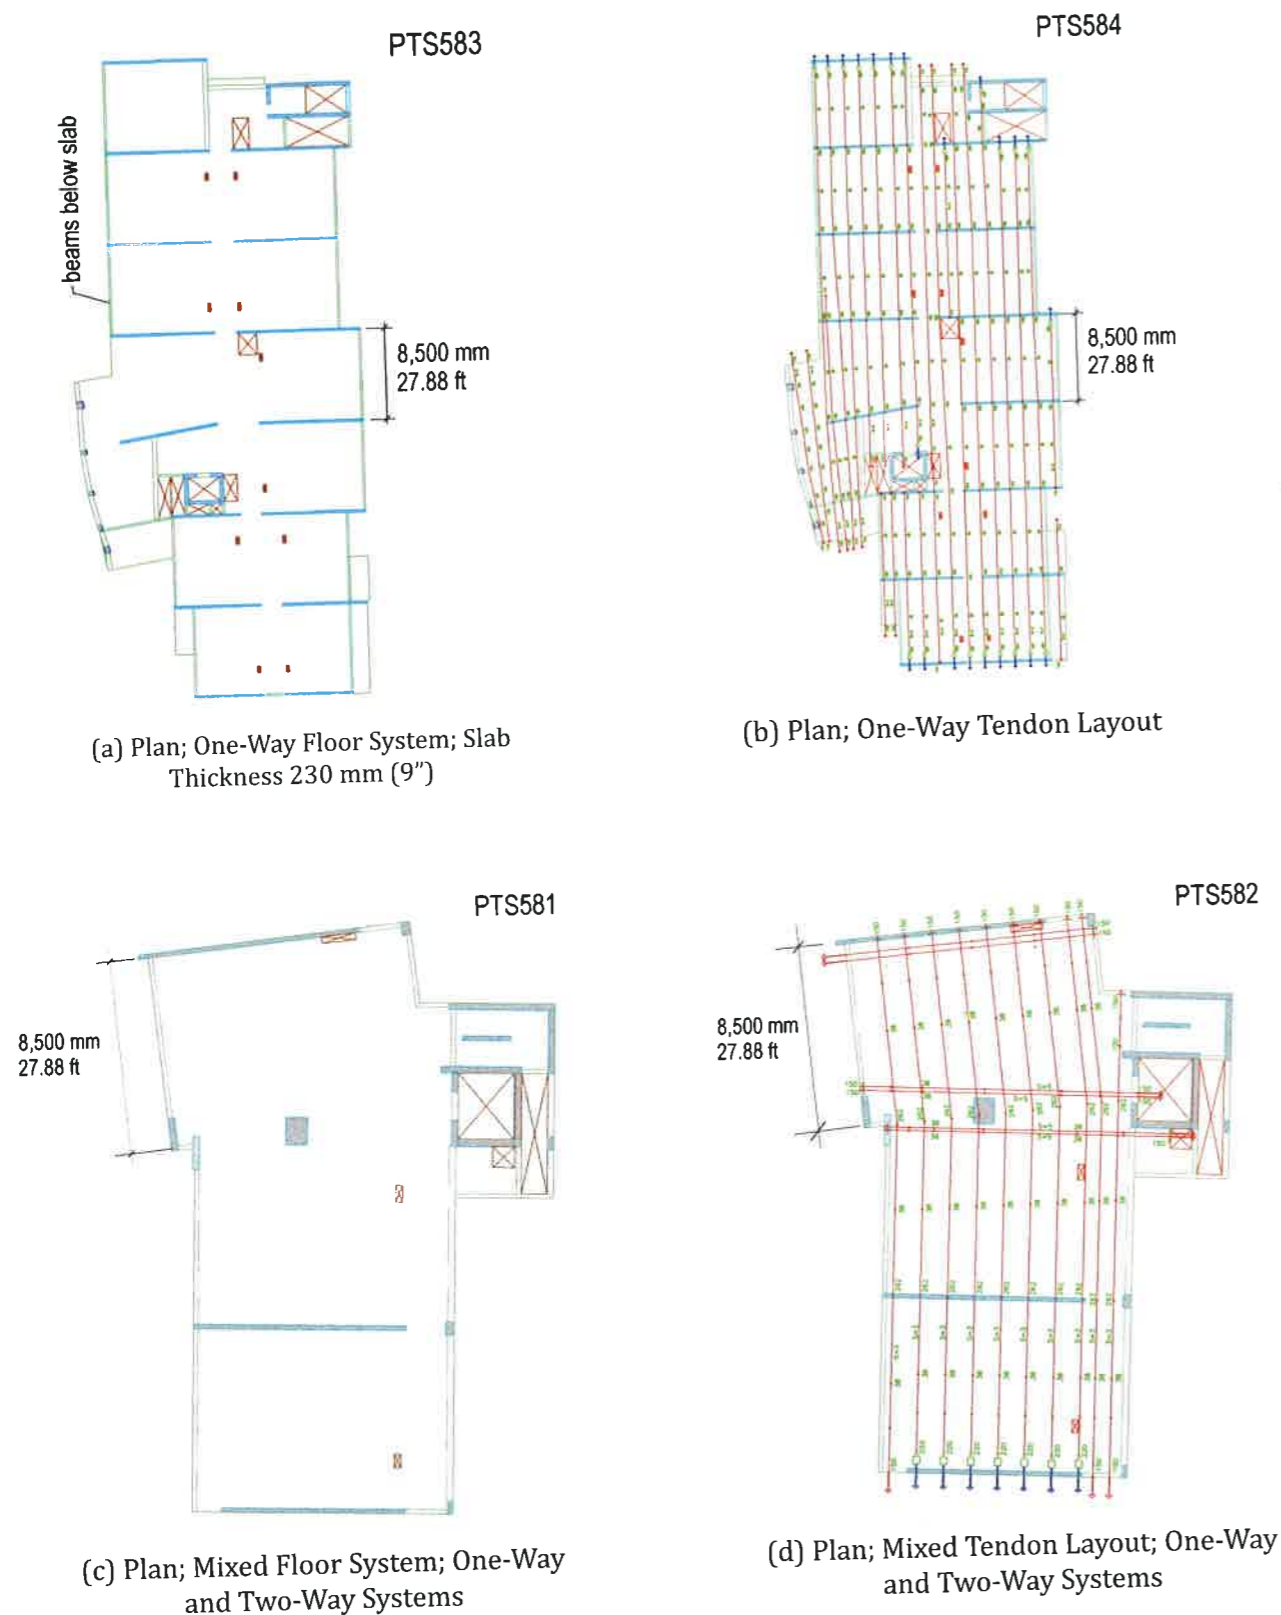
Examples of Floor System Classifications (Burj View, bonded system, KSA)
